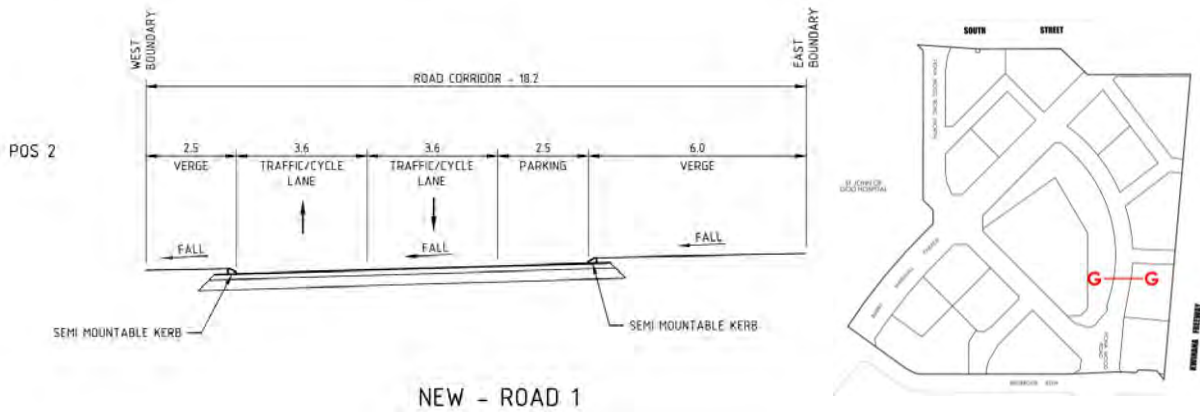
Section G-G Murdoch Boulevard (Road 1) South
